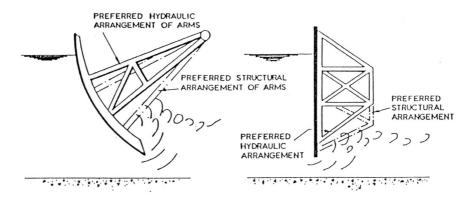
Preferred hydraulic structural arrangement of a gate subject to drowned discharge
